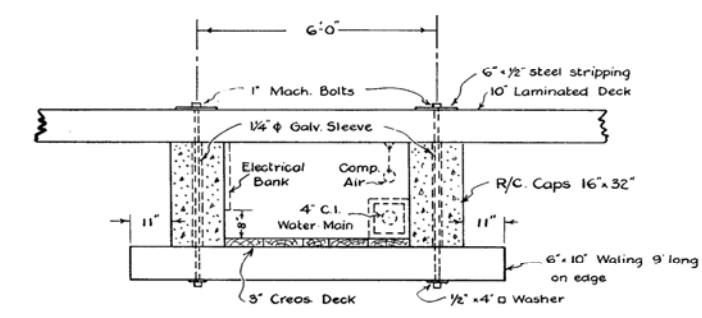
CROSS-SECTION OF MANWAY (UNIT 1)
